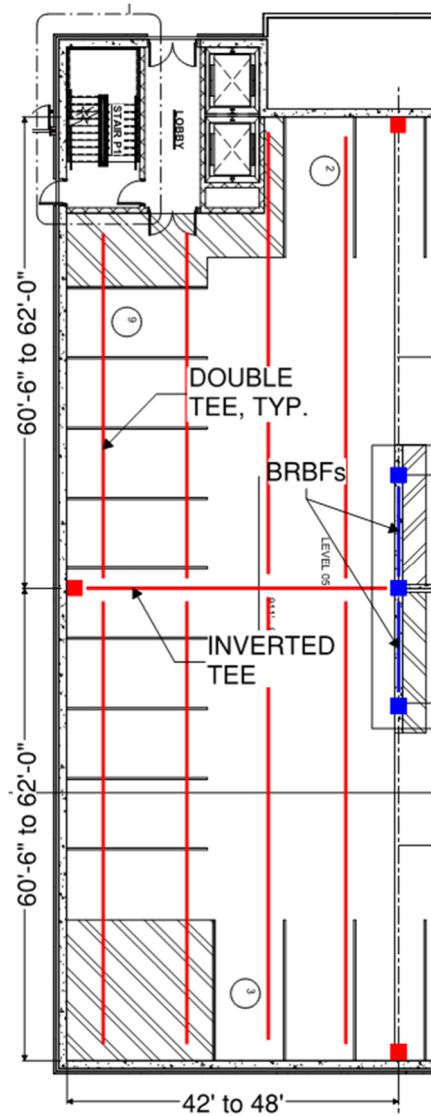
Floor layout of prototype structure, original drawing courtesy of Metromont
